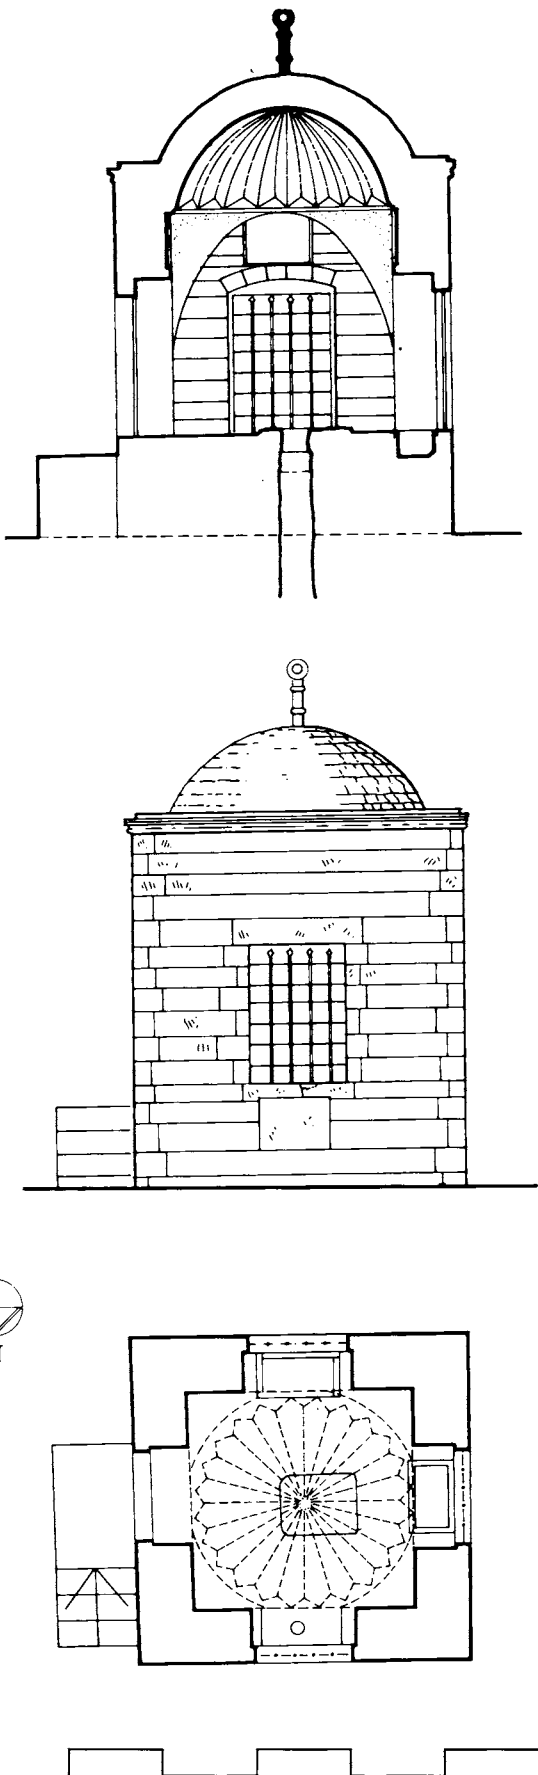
Sabil Bab al-Maghariba, section, elevation and plan.
